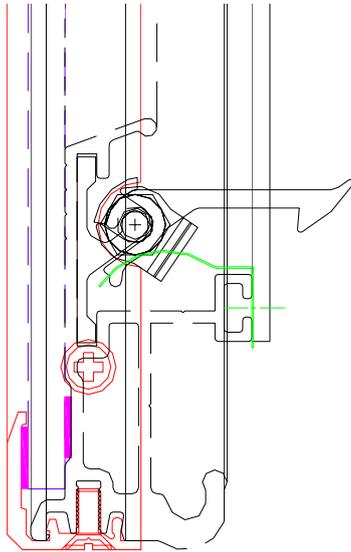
Section of Door Showing Glazing Retainer
